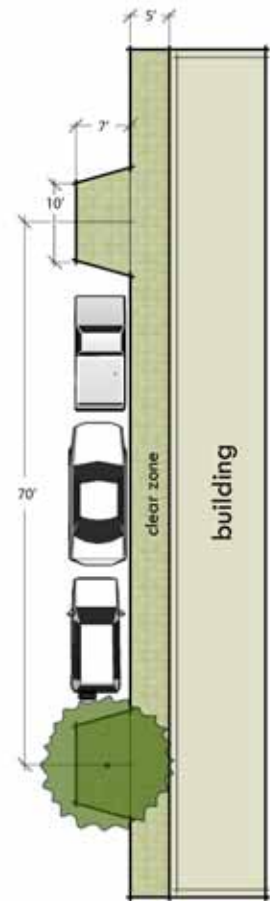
On-street parking on TOD Local Street without street tree/furniture zone.
